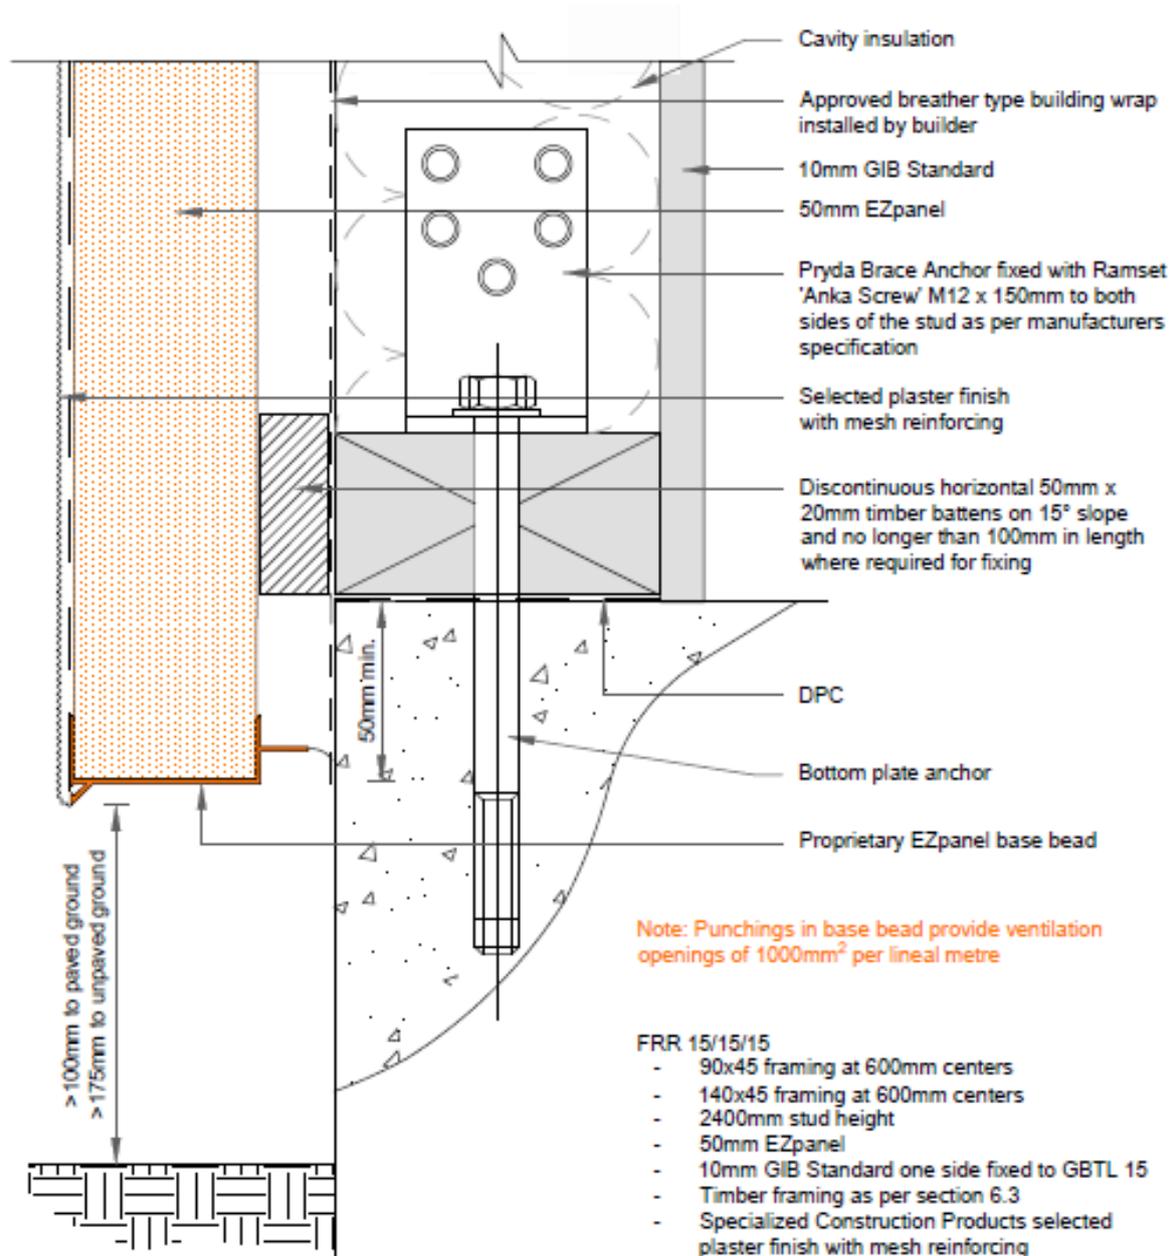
EZPanel Lightweight Concrete Cladding System Supported on the Floor Slab
